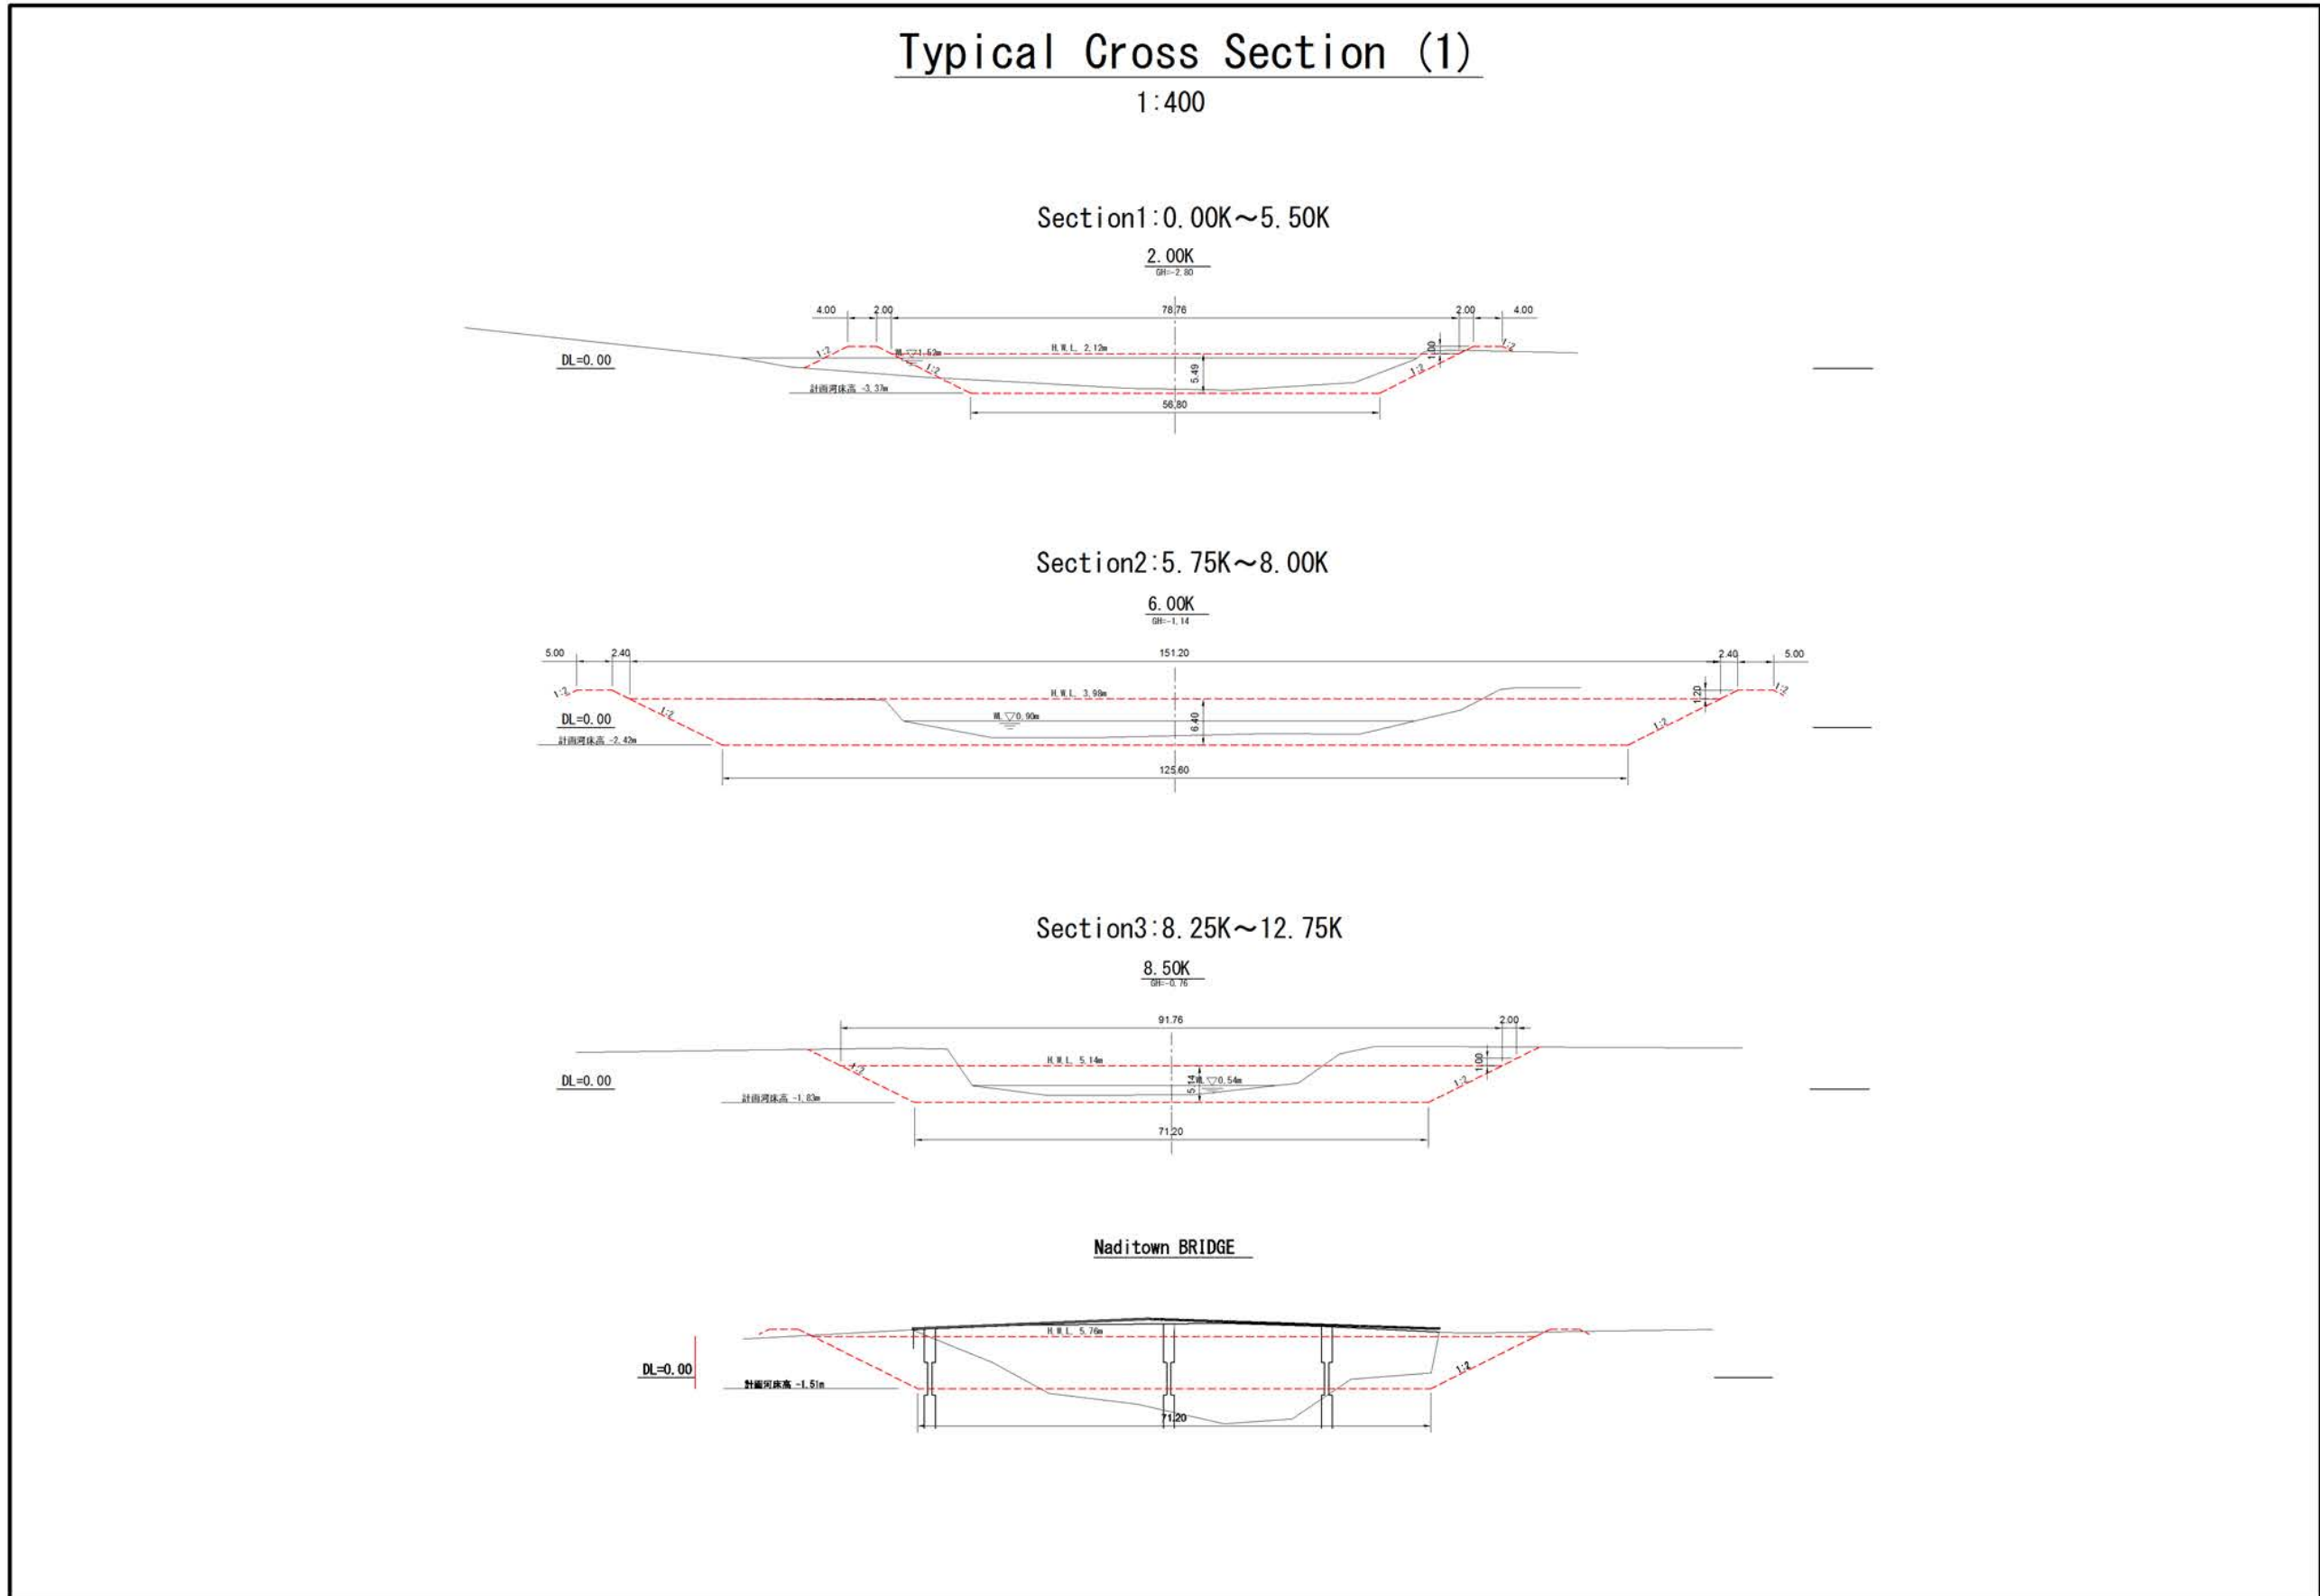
Examples of Present Cross Section (solid line) and Design Cross Section (broken line)
